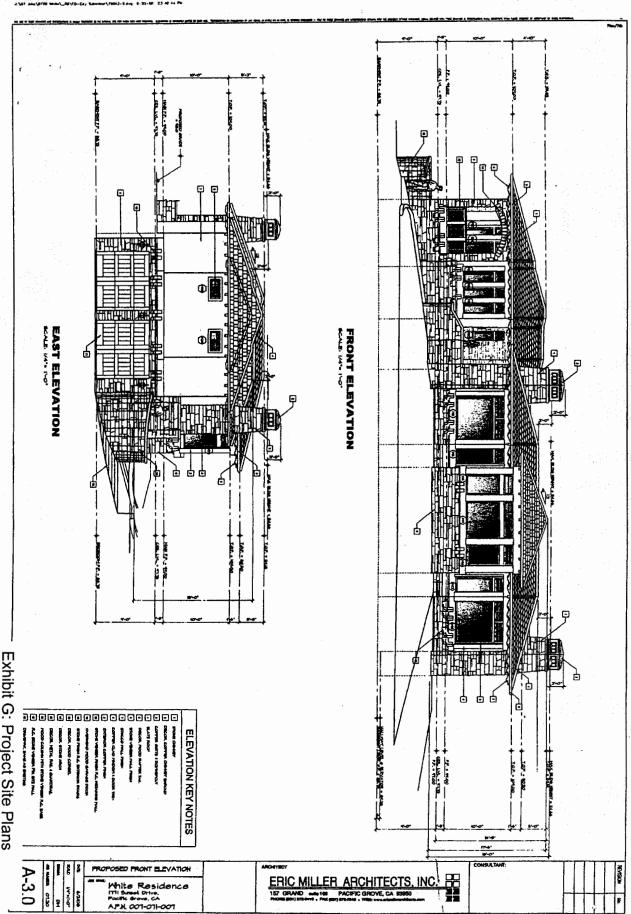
Exhibit G: Project Site Plans 3-09-012; White Demo and Rebuild Page 4 of 6
